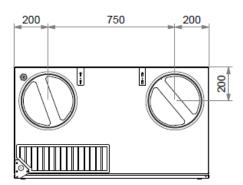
Dimensional drawing [in mm], top of AME 900 F unit
